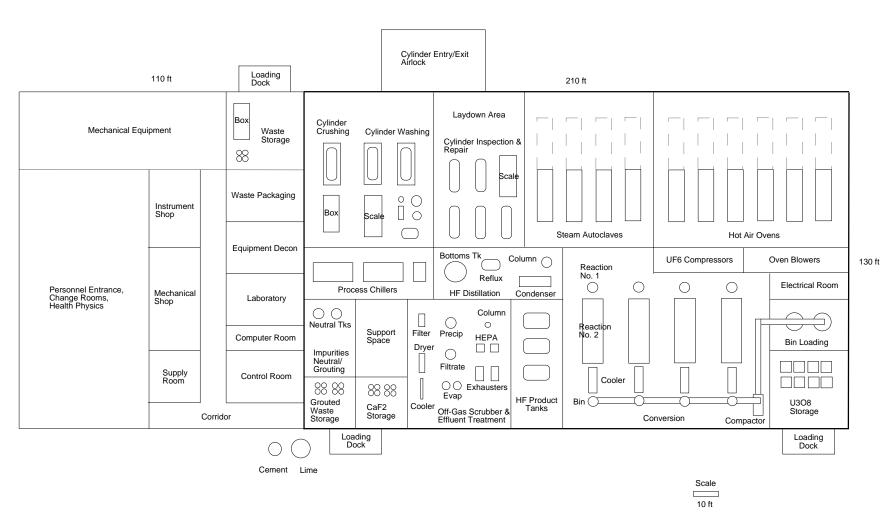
Process Building General Arrangement Conversion to U3O8 and AHF (25 yr)
